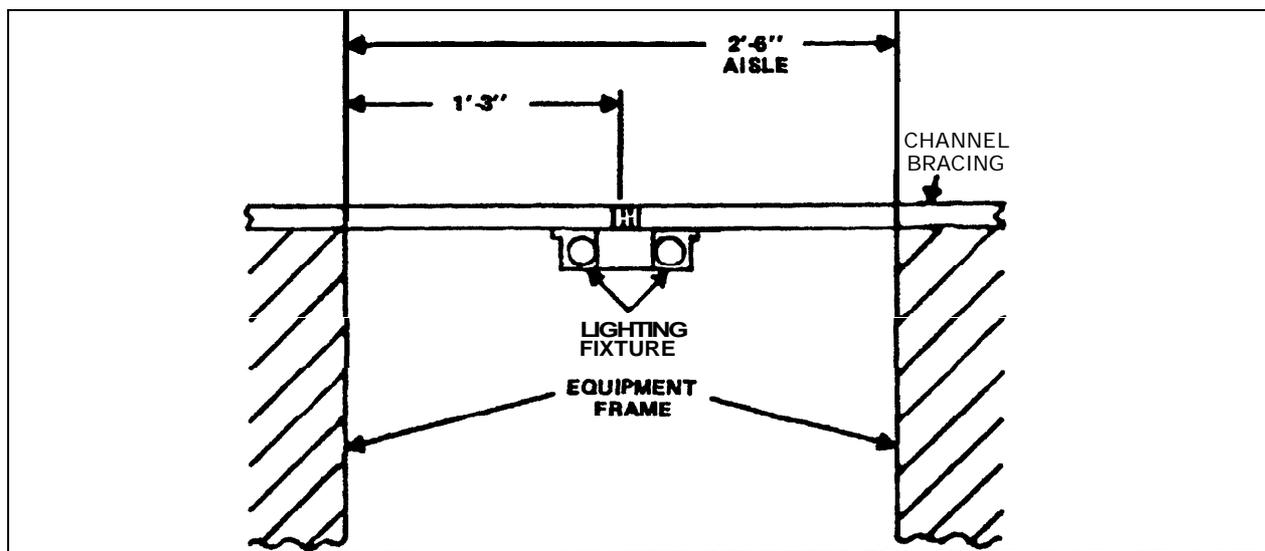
Typical Placement of Lighting Between Equipment Frames (Without Ladders)
